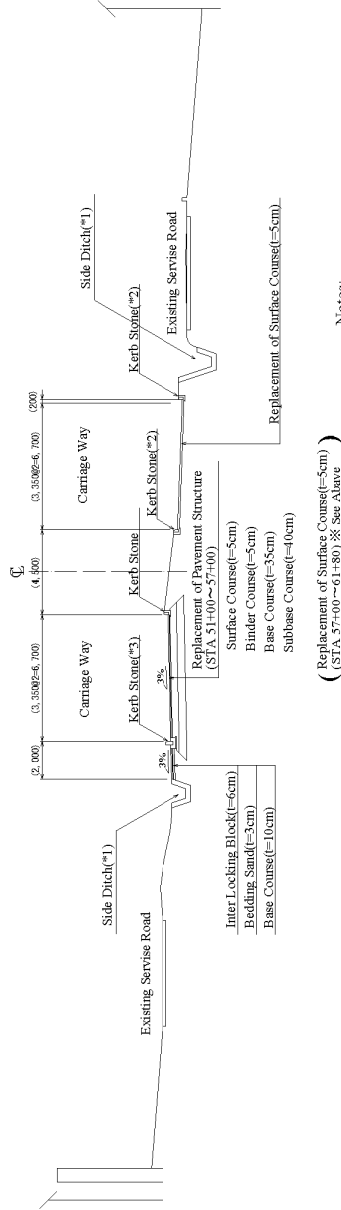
Section-3 (Chichiri RA to Maselema RA) Typical Cross Section
